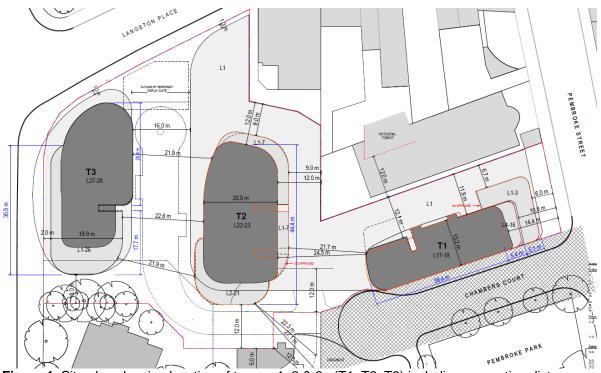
Site plan showing location of towers 1, 2 & 3 (T1, T2, T3) including separation distances.
